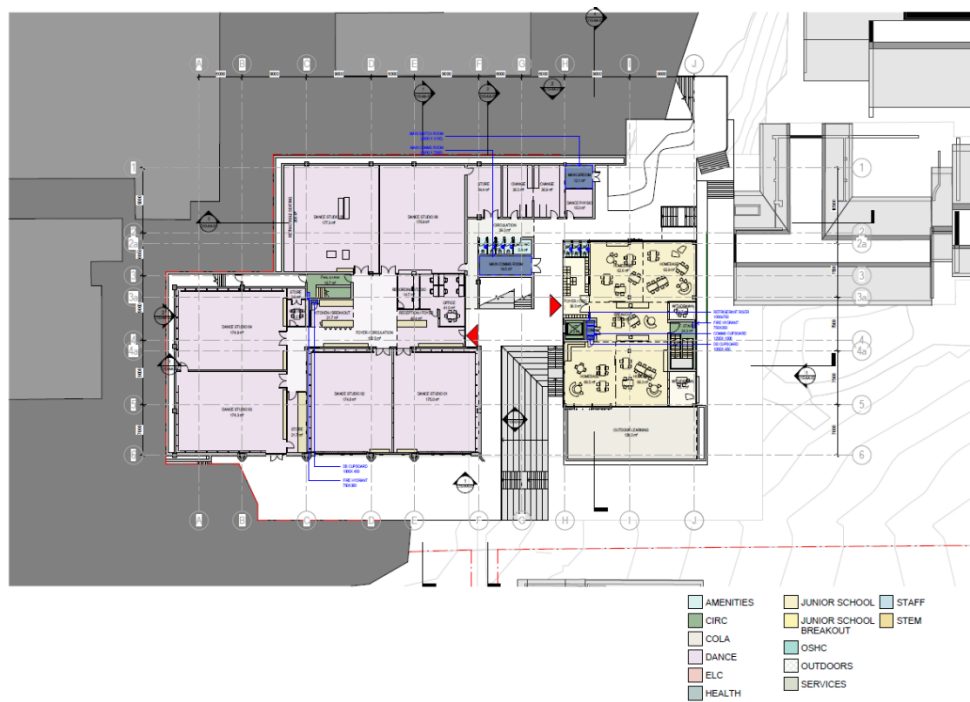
Proposed General Arrangement Plan - Level 01. (Source: BVN)
